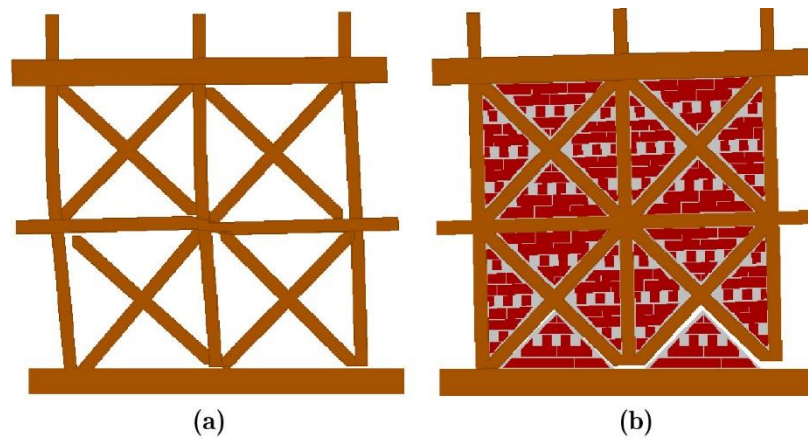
Deformation of the Pombalino specimens: (a) bare frame and (b) infilled frame (Poletti 2013).
